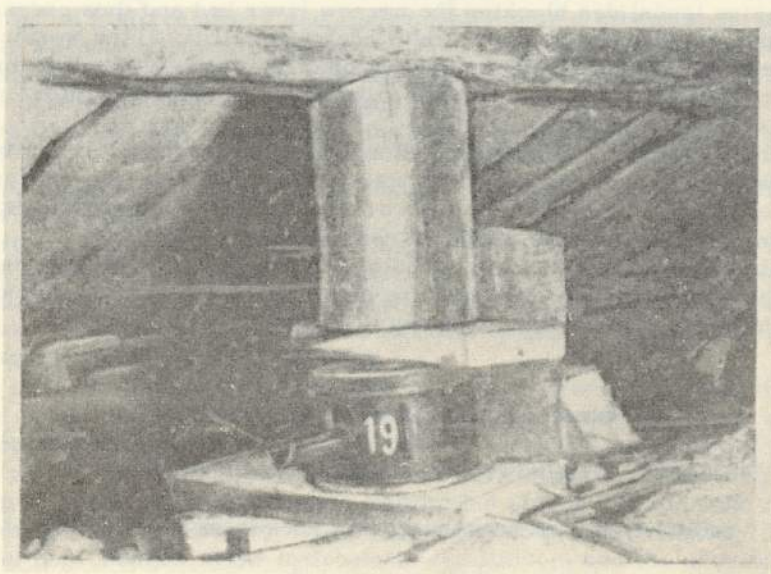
Installation of dynamometers on the timber supports of the tunnel widened to its full profile
